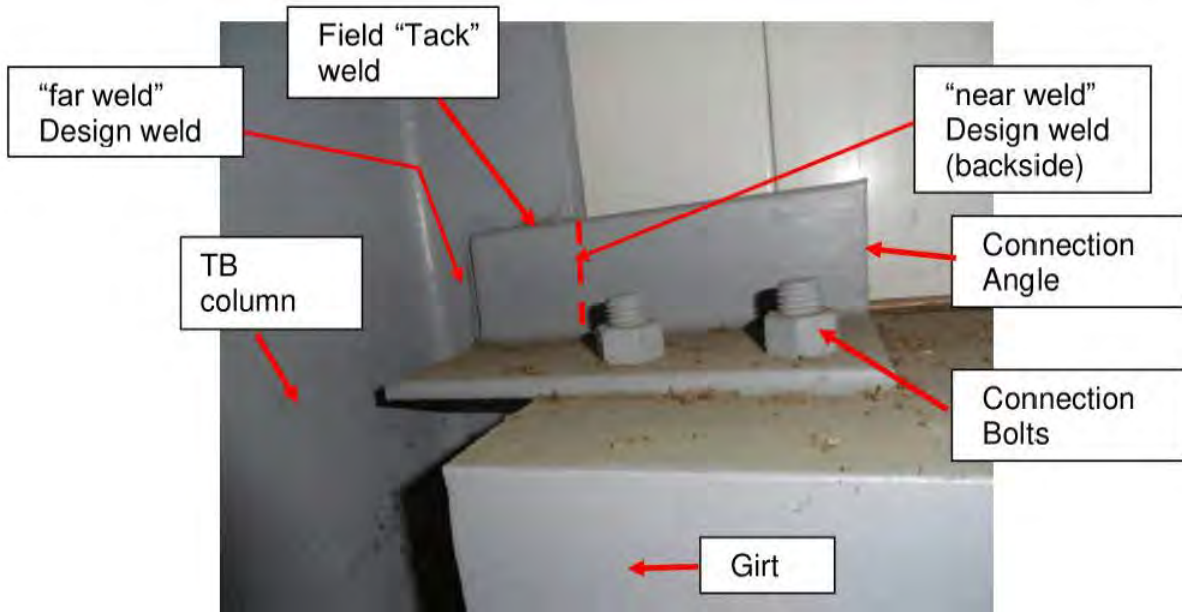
General View of the Blowout Panel Girt Attachment to Building Column
